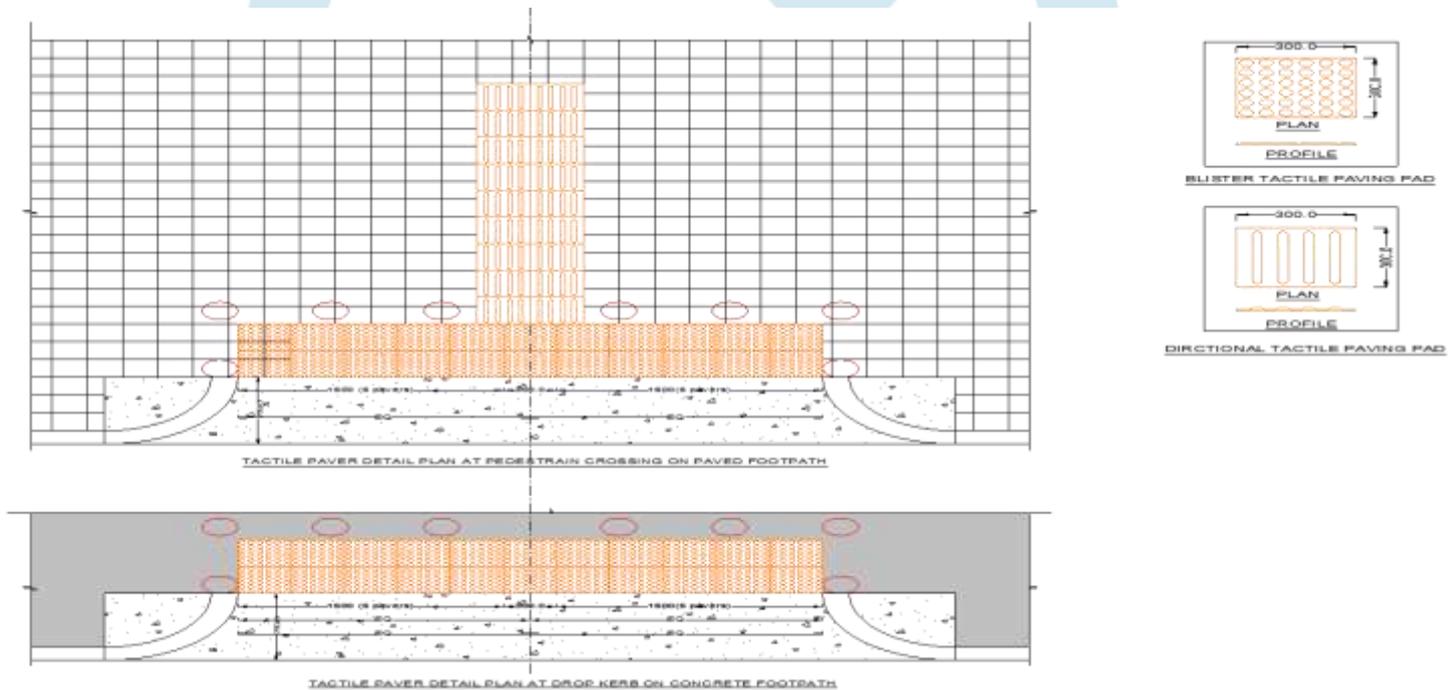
Typical sections of tactile paver details at pedestrian crossing
